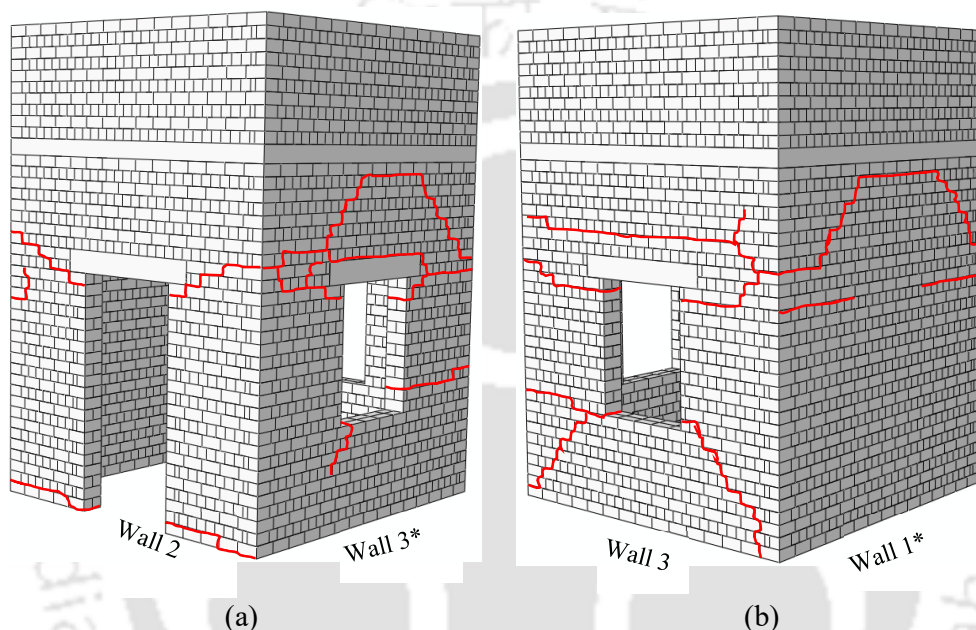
Damage pattern observed during the slow cyclic lateral load testing of full-scale URM building: (a) damage observed in Wall 2 and Wall 3*, and (b) damage observed in Wall 1* and Wall 3.
